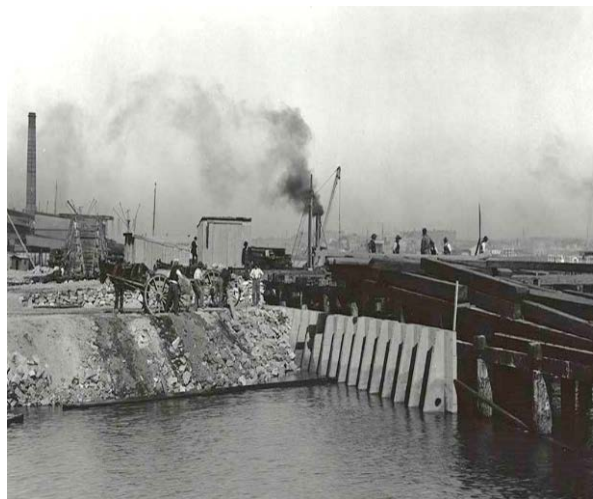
Example of Monier trestle seawall being constructed, Darling Harbour (n.d.).⁴²
